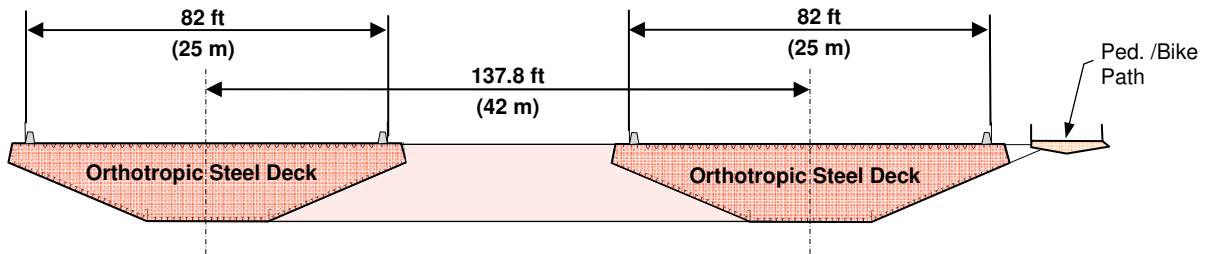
Cross Section of the SAS Bay Bridge Showing Two Separate Orthotropic Decks Connected to Each Other by Transverse Steel Box Girders
